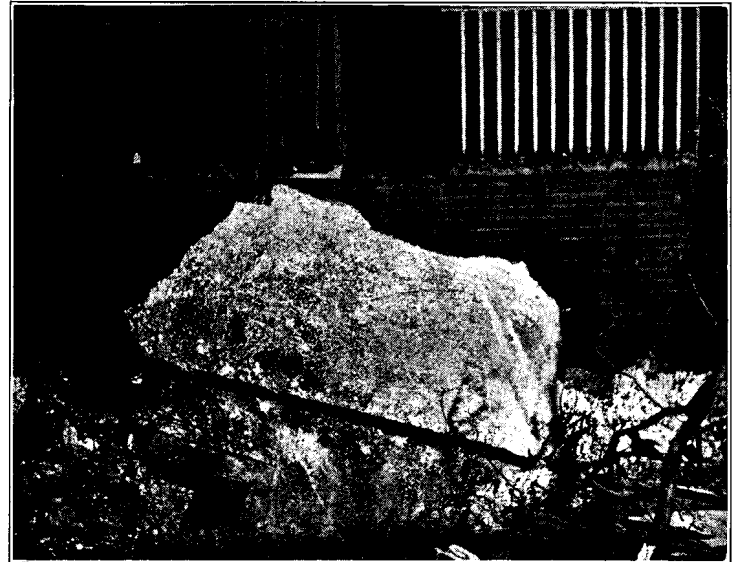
READING EXPLOSION. WRECKED MANHOLE.
